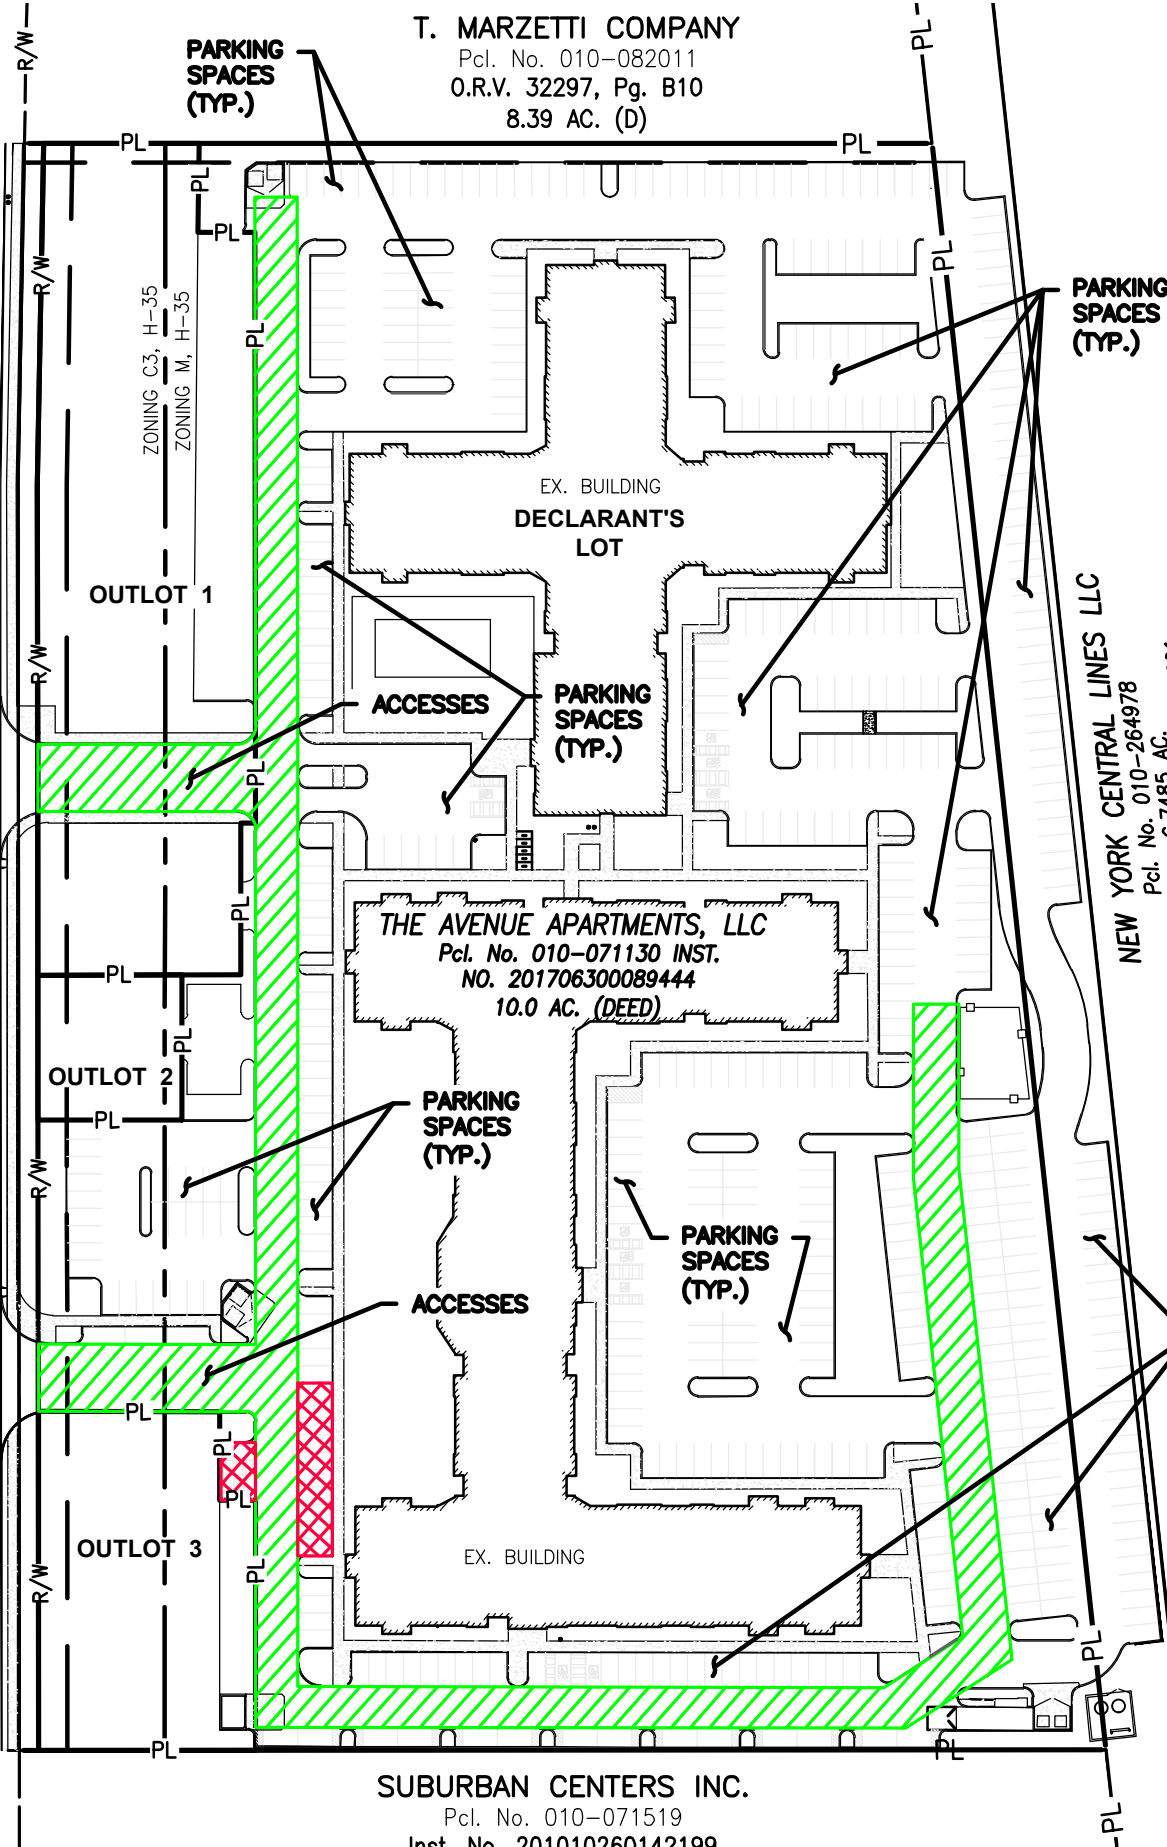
EXHIBIT "C" ACCESS EASEMENT & PARKING EASEMENT
